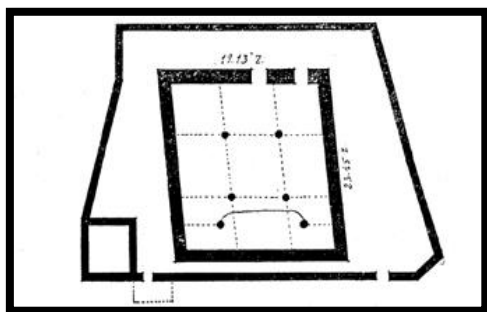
Surp Hagop Church Restitution Plan (Sunguroğlu, 1958)
